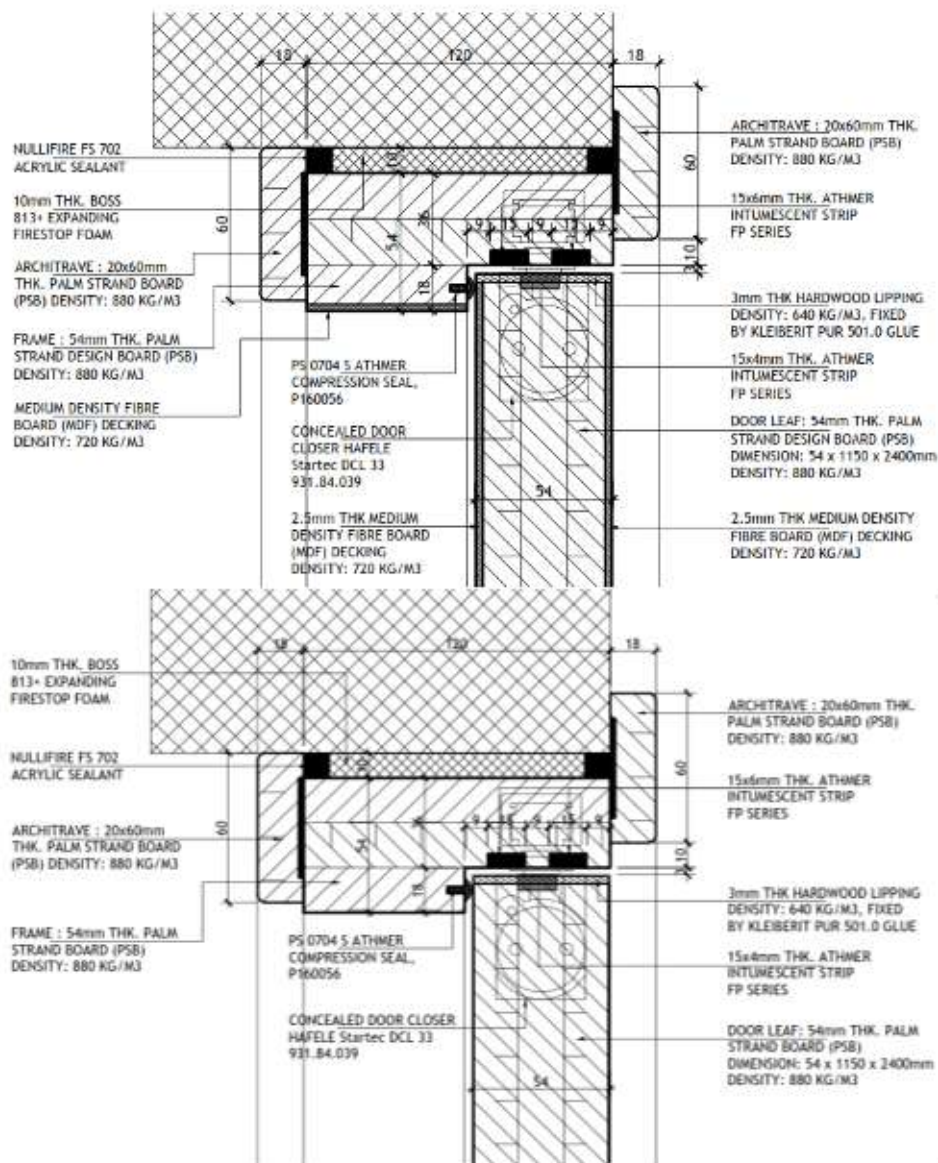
Top edge cross-section of door 1 and door 2 respectively.
